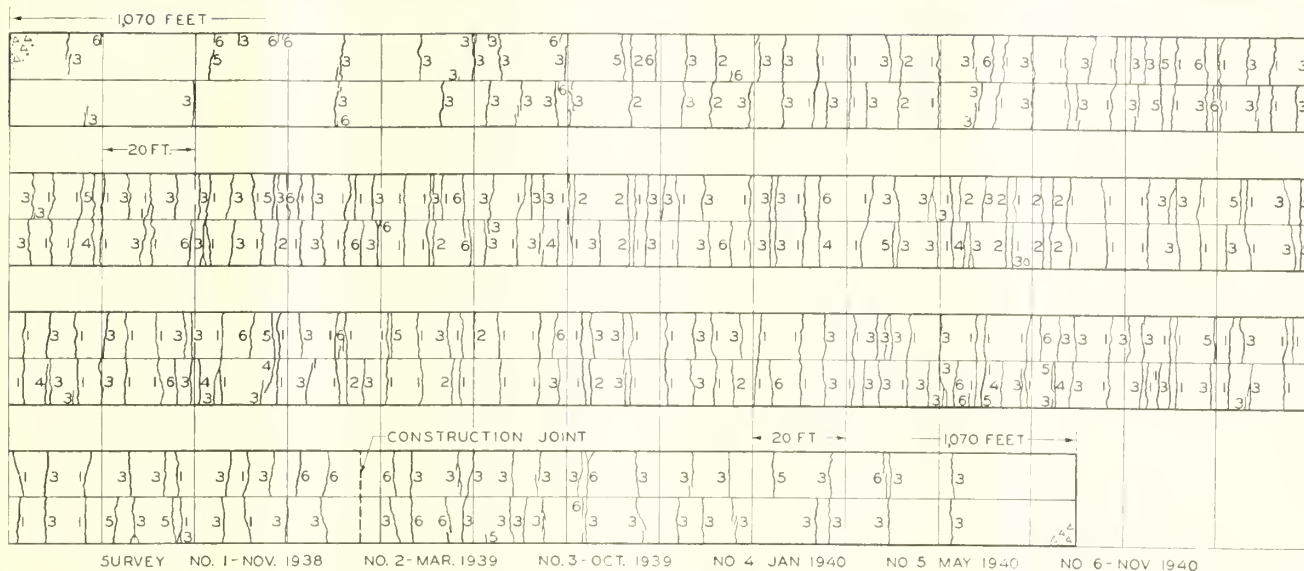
TYPICAL CRACK SURVEY SHEET FOR LONG SECTIONS REINFORCED WITH 1-INCH DIAMETER STEEL; SECTIONS PLACED SEPTEMBER-OCTOBER, 1938.
